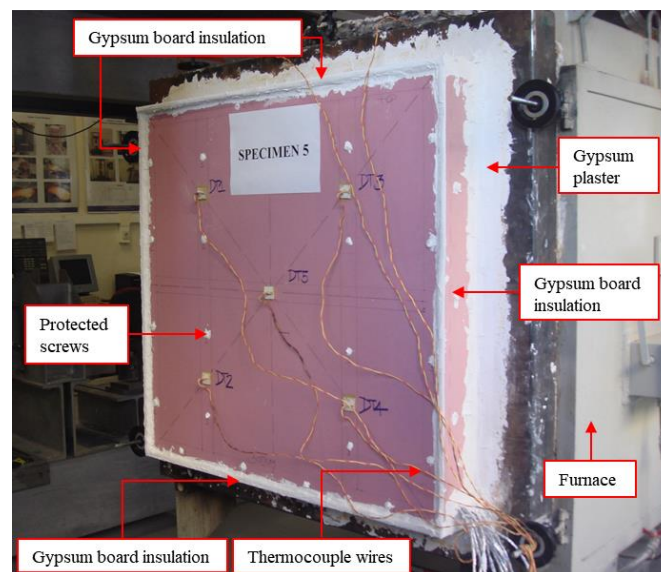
Wall specimen placed in the furnace (specimen 5).
